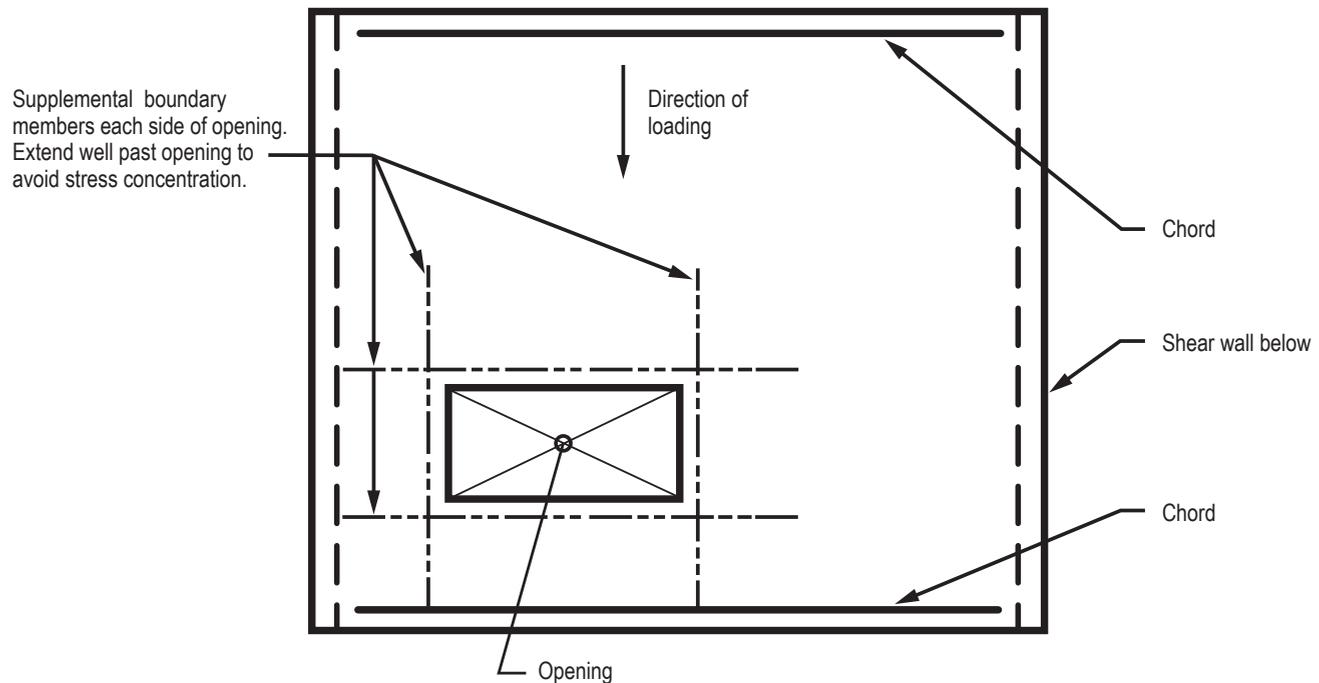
Wood light-frame diaphragm with opening. Supplemental boundary members are added around the opening.
